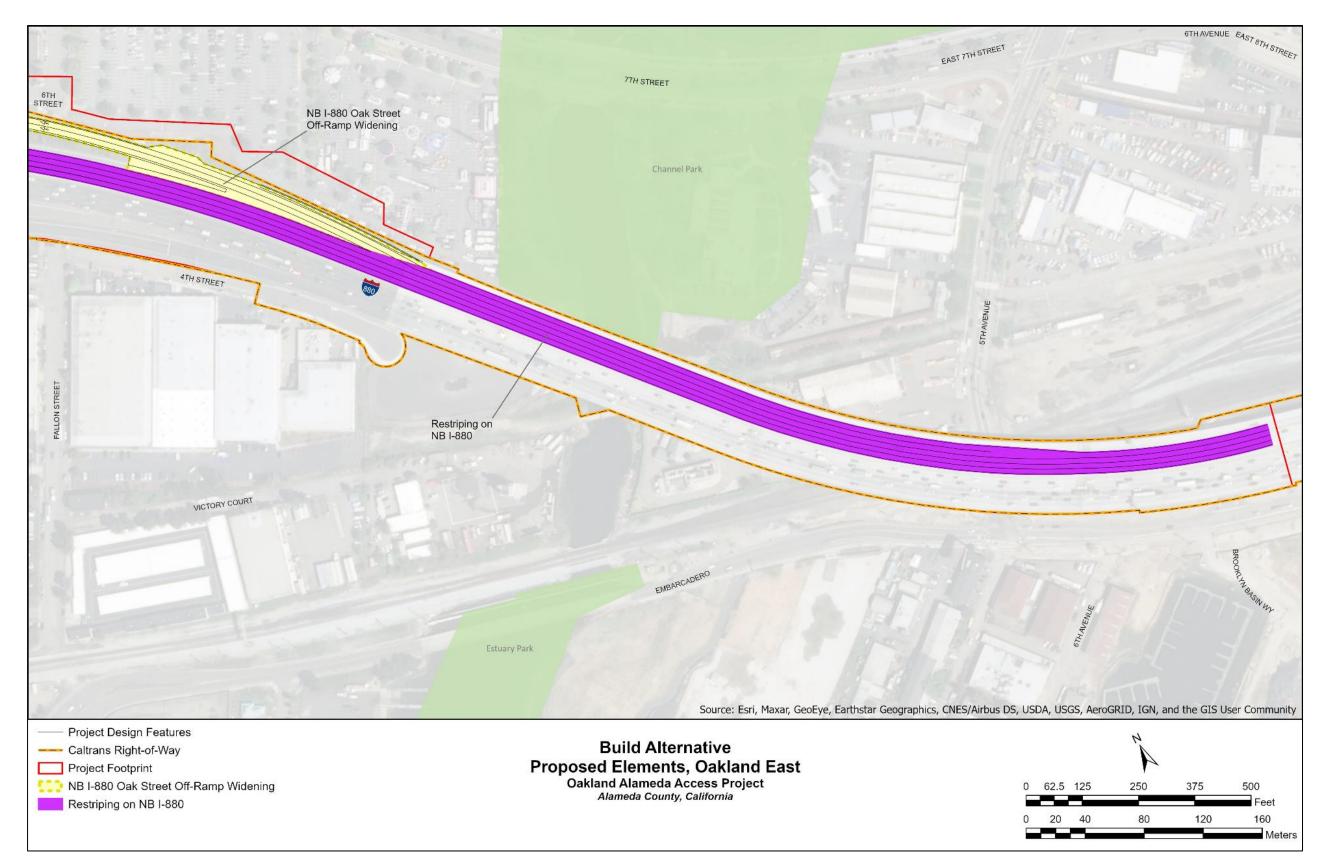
Build Alternative Proposed Elements, Oakland (East)
